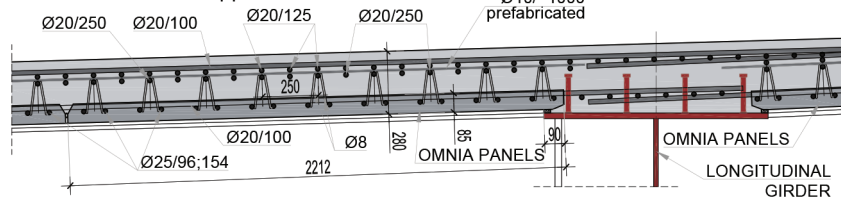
Deck reinforcement details (longitudinal and cross sections)
